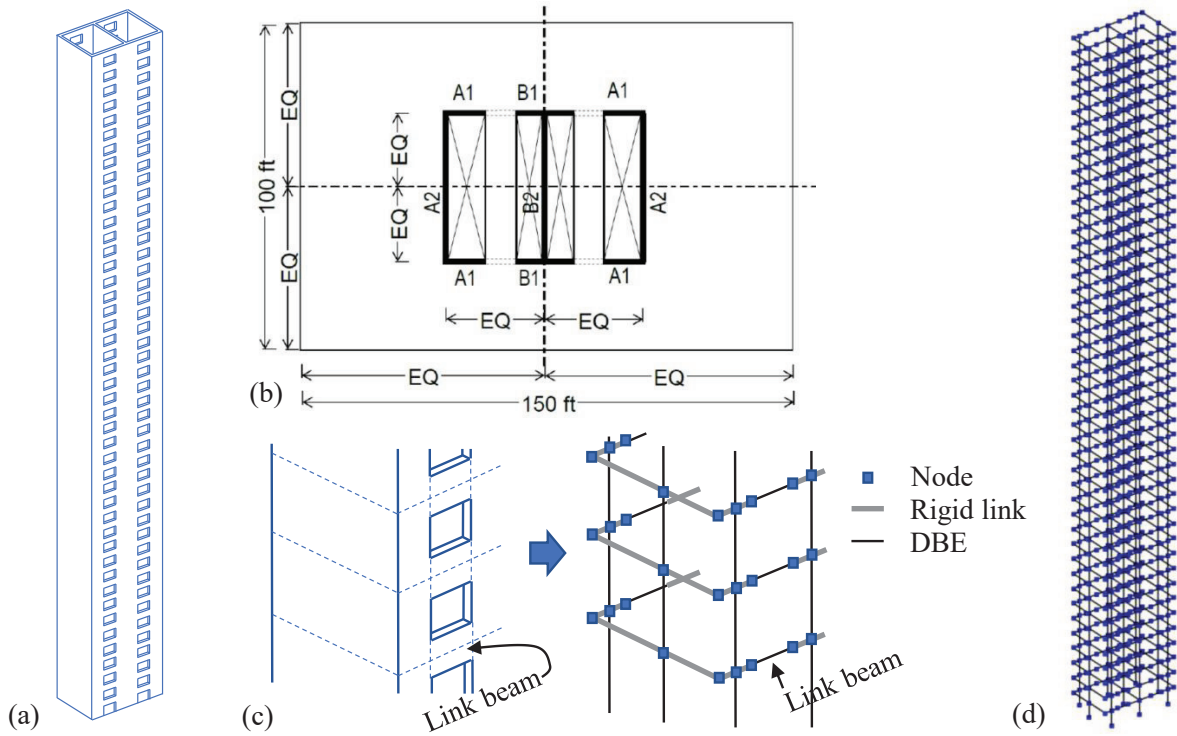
The case study building: (a) Core; (b) Plan view; (c) Modeling strategy; (d) 3D finite element model.
